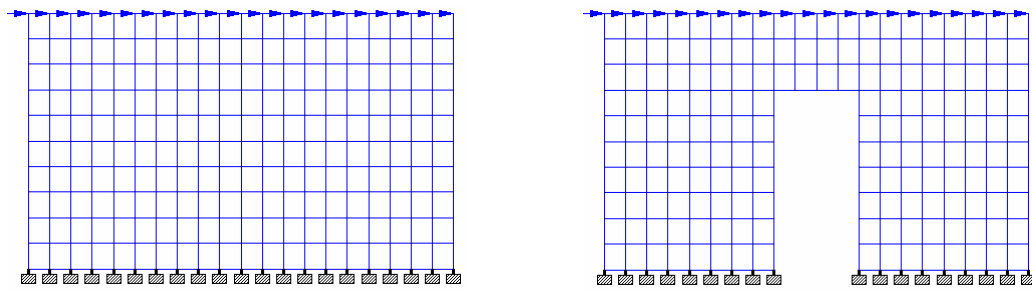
Sections of 12-story buildings with different sizes and locations of door and window openings in shear walls
